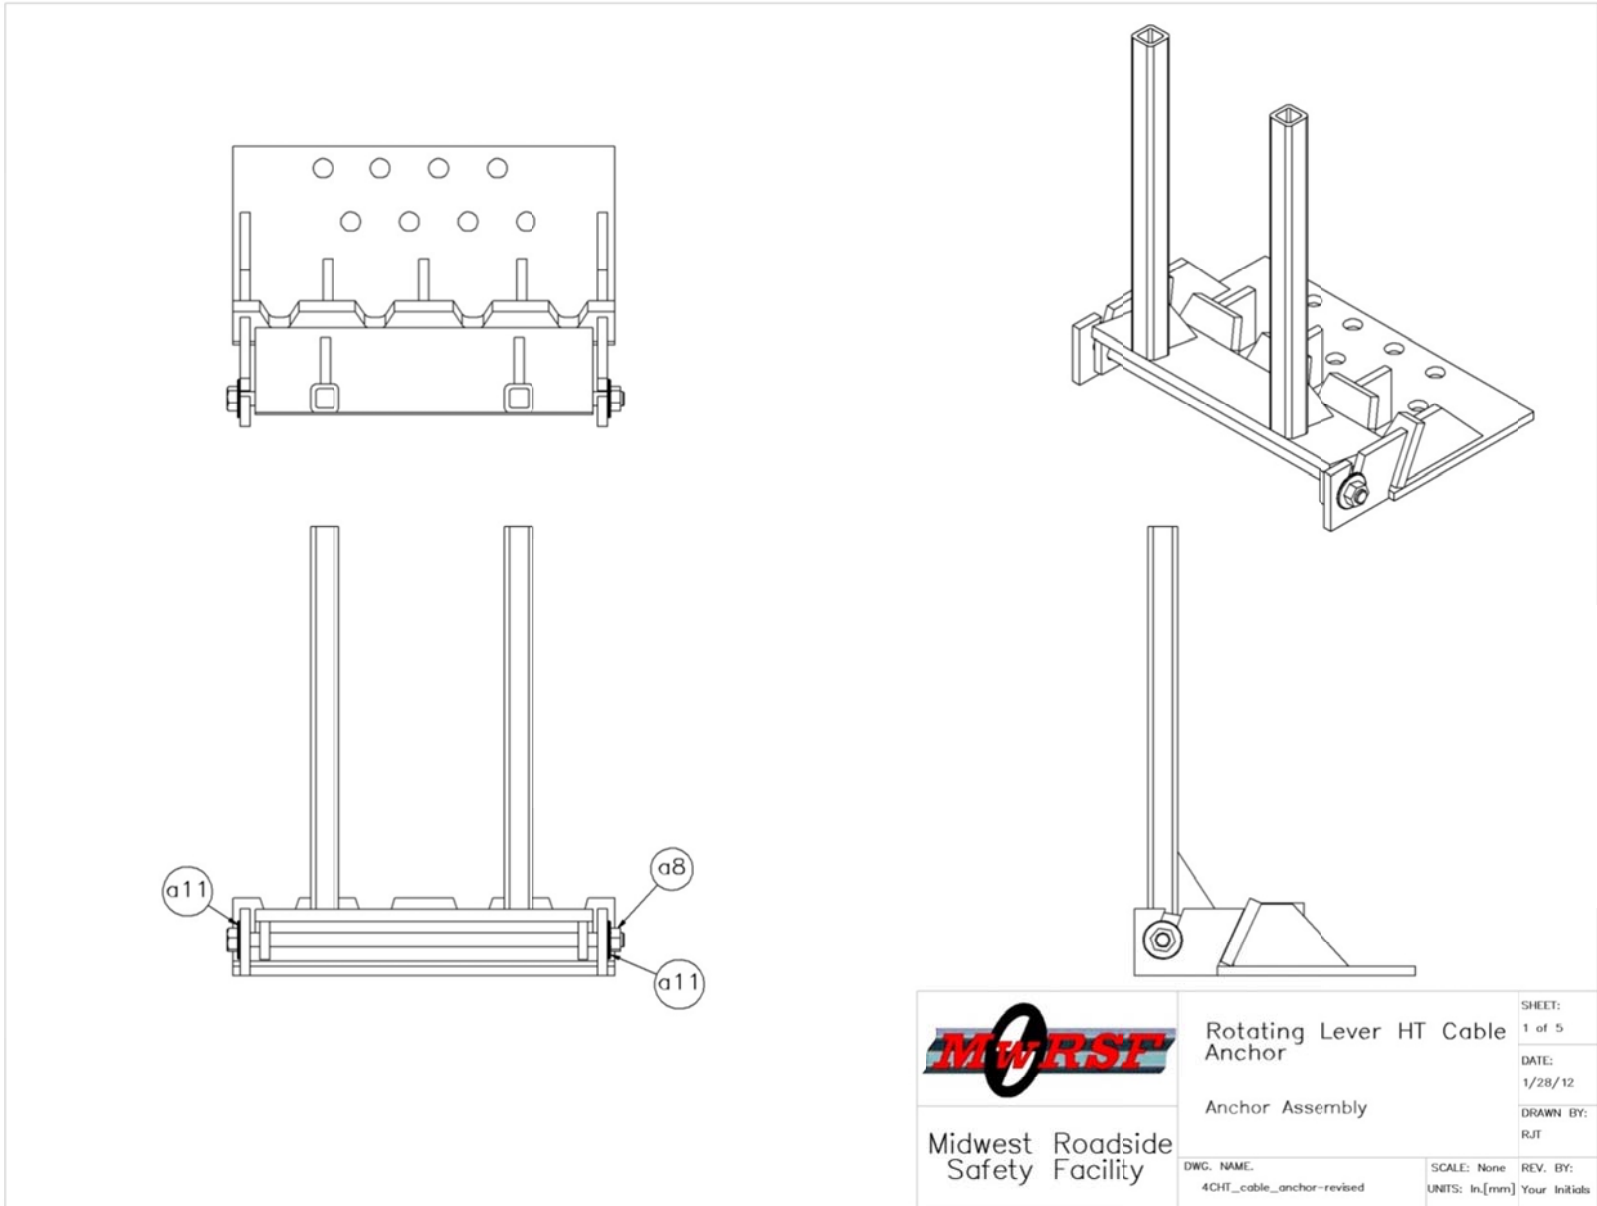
Redesigned, High-Tension, Cable Anchor Bracket Assembly
